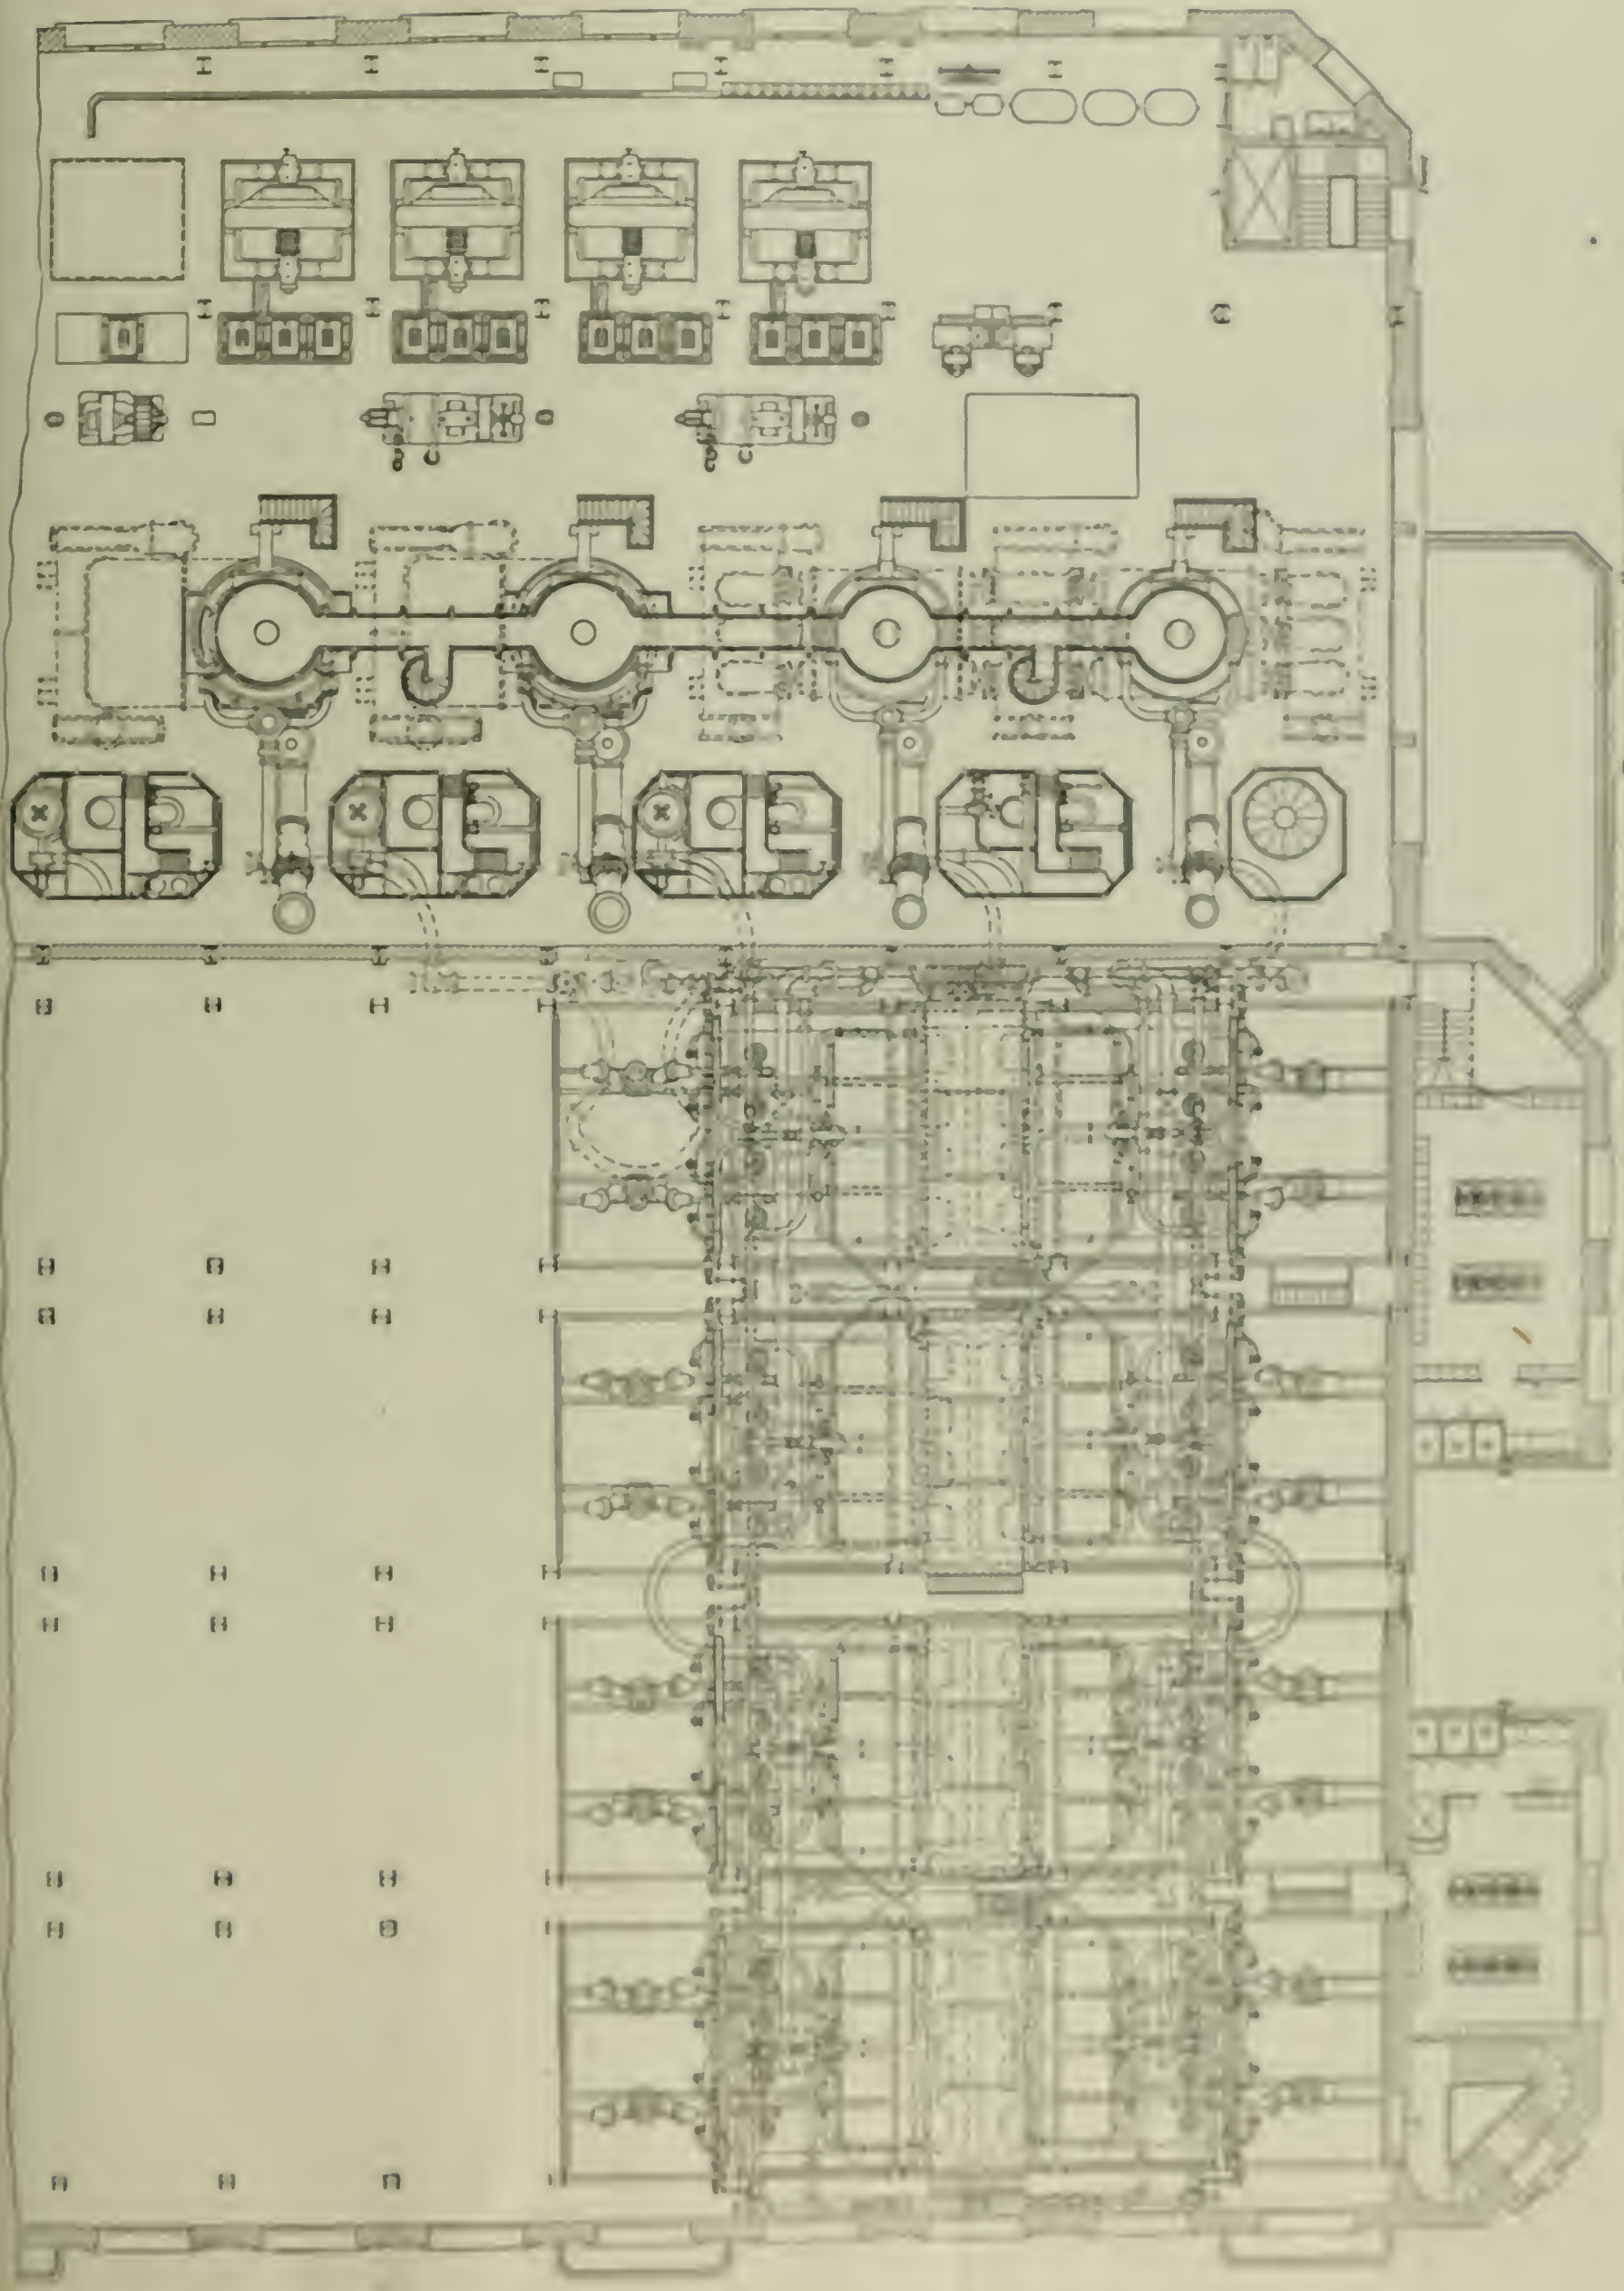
PLAN VIEW OF PLANT, SHOWING ARRANGEMENT OF BOILERS AND TURBINE-ROOM EQUIPMENT
